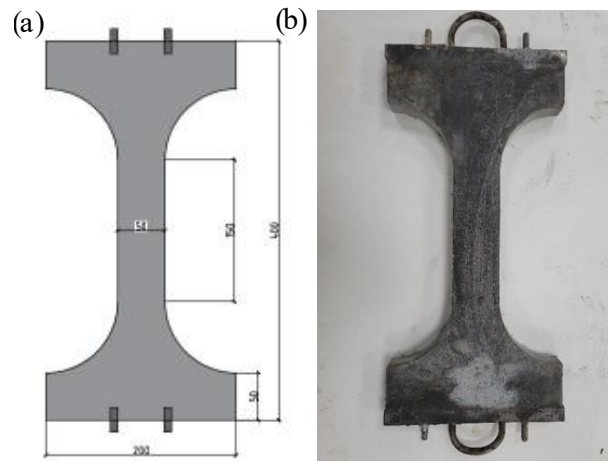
1: Dog-bone specimens: (a) dimension; (b) actual specimen.
